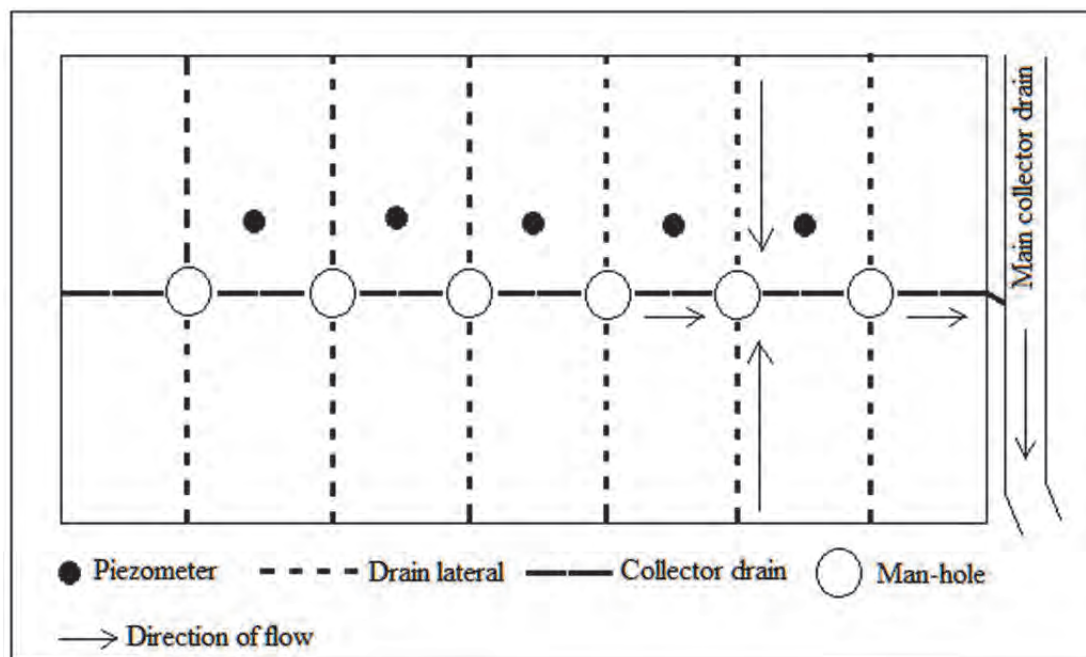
Layout of piezometers at mid-span spacing (adapted from Malota, 2012)
